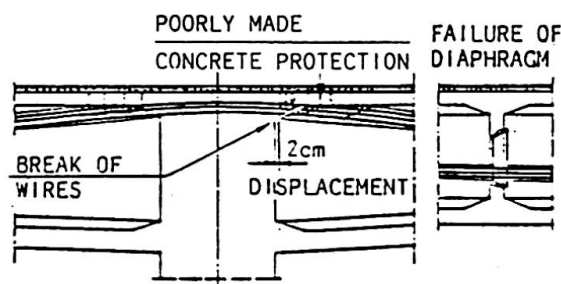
POORLY MADE CONCRETE PROTECTION
